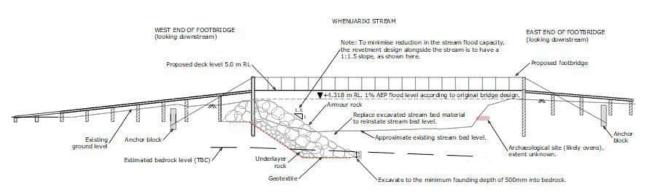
Figure F- Cross section of proposed bridge and rock revetment (full size drawing is in Appendix)
